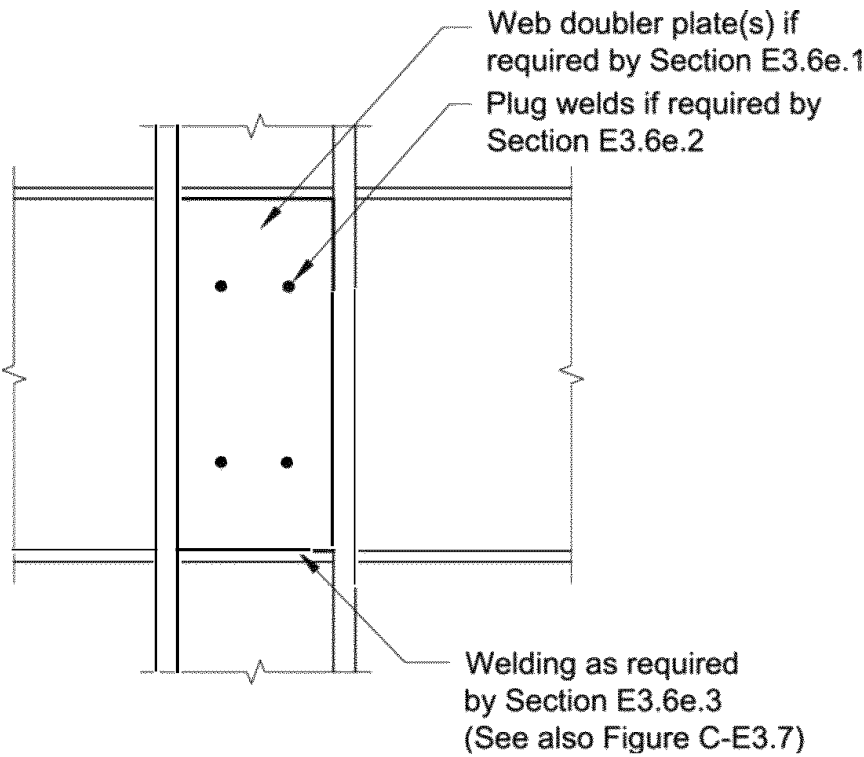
Connecting web doubler plates with plug welds.
